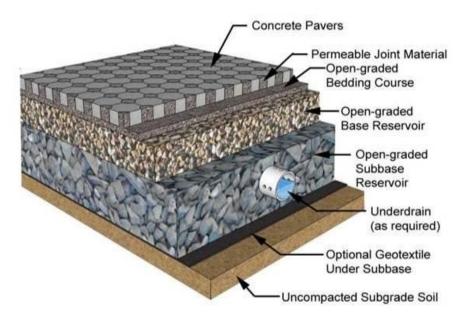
Permeable Pavement System (PPS) sectional layout (Source: Virgina DEQ Stormwater Design Specification, No.7, Permeable Pavement)
